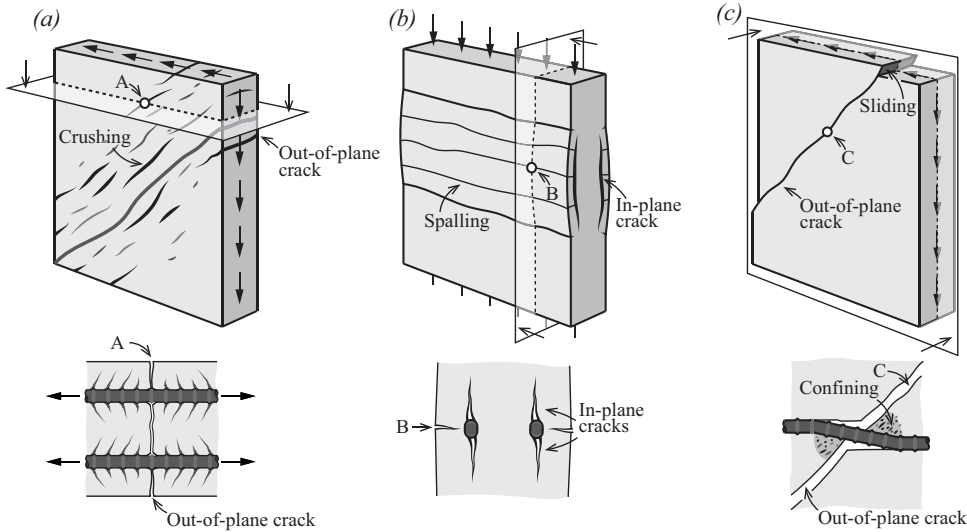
Failure mechanisms of reinforced concrete panels: (a) concrete crushing; (b) concrete cover spalling; (c) concrete sliding
